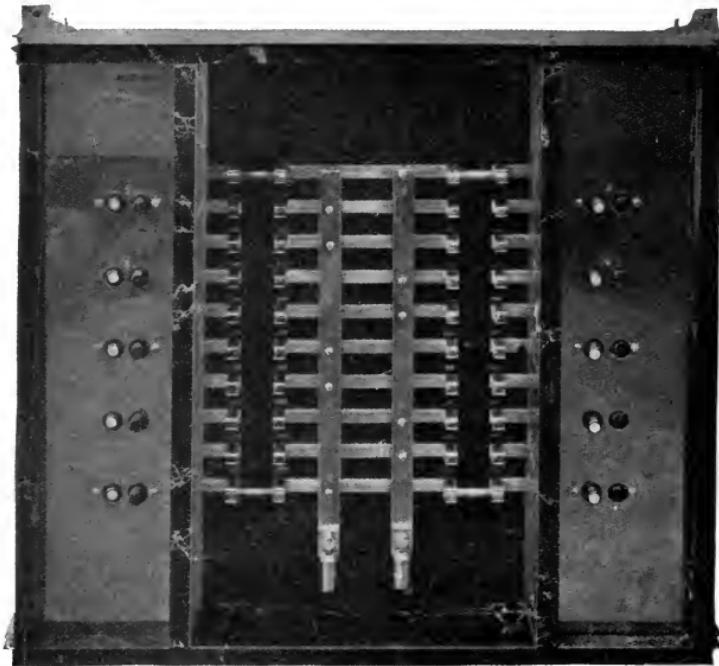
Cut-Out Panel with Push-Button Switches. Cover Removed.
